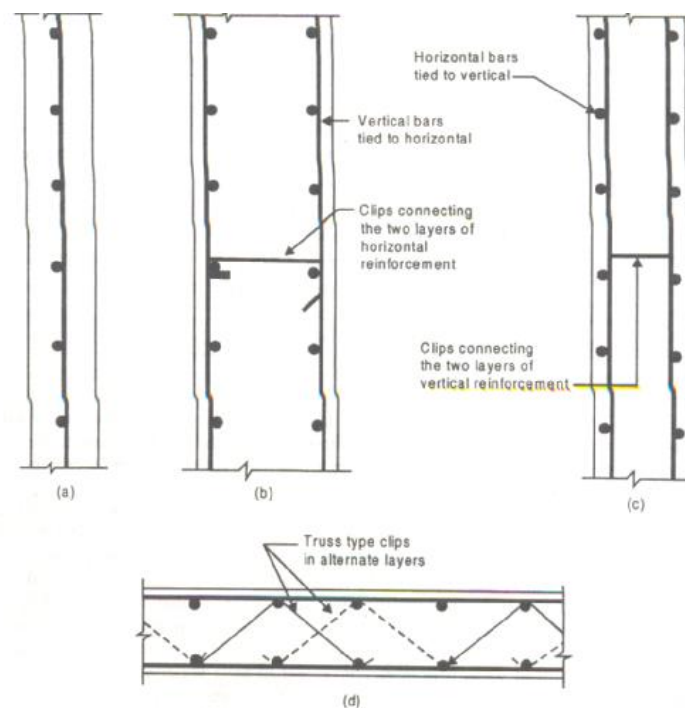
Detailing of steel in reinforced concrete walls: (a) Wall thickness ≤ 170 mm; (b) Wall thickness > 220 mm; (c) Wall thickness > 170 mm but < 220 mm; (d) Truss type clips (links) in alternate layers in a wall.
